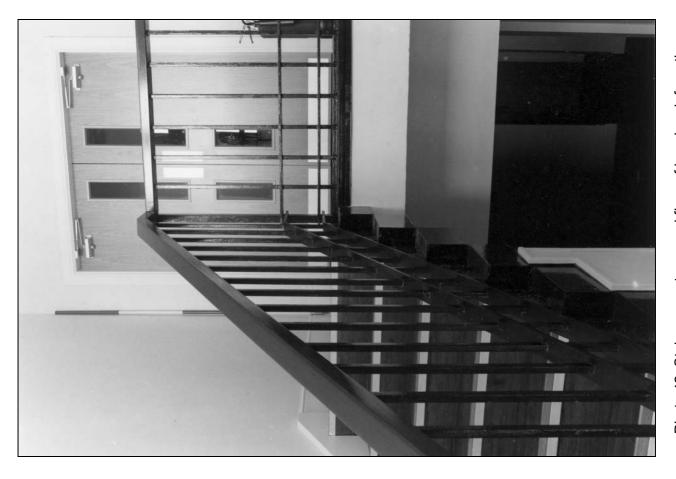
Staircase up to ground floor of boys' end, from the north (film 4, frame 2)
